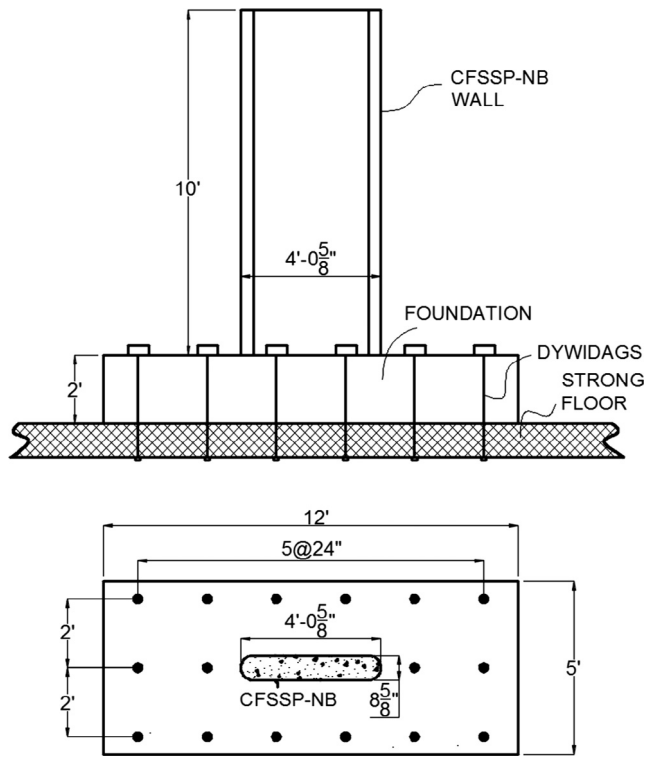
Elevation and plan view of the CFSSP-NB wall model.
